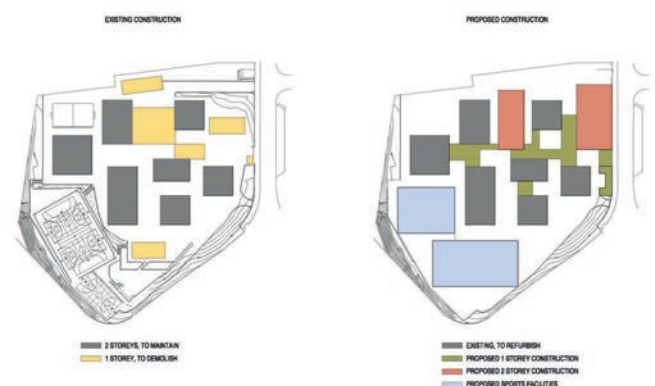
Santa Maria Secondary School, Left: Original plan, Right: renovation project.
